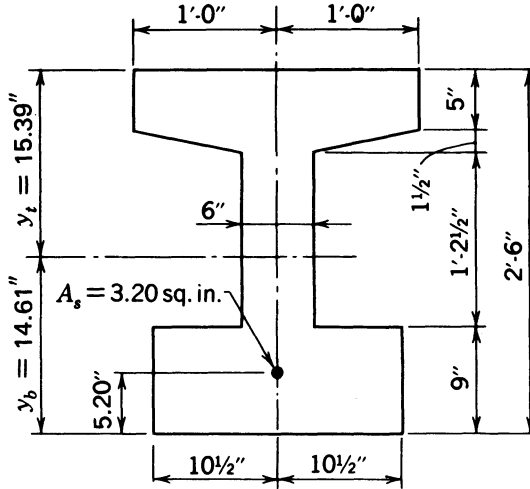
Cross section used to demonstrate the effect of the transformed and net beam cross sections as compared to gross cross section in I.P. 4-13.
